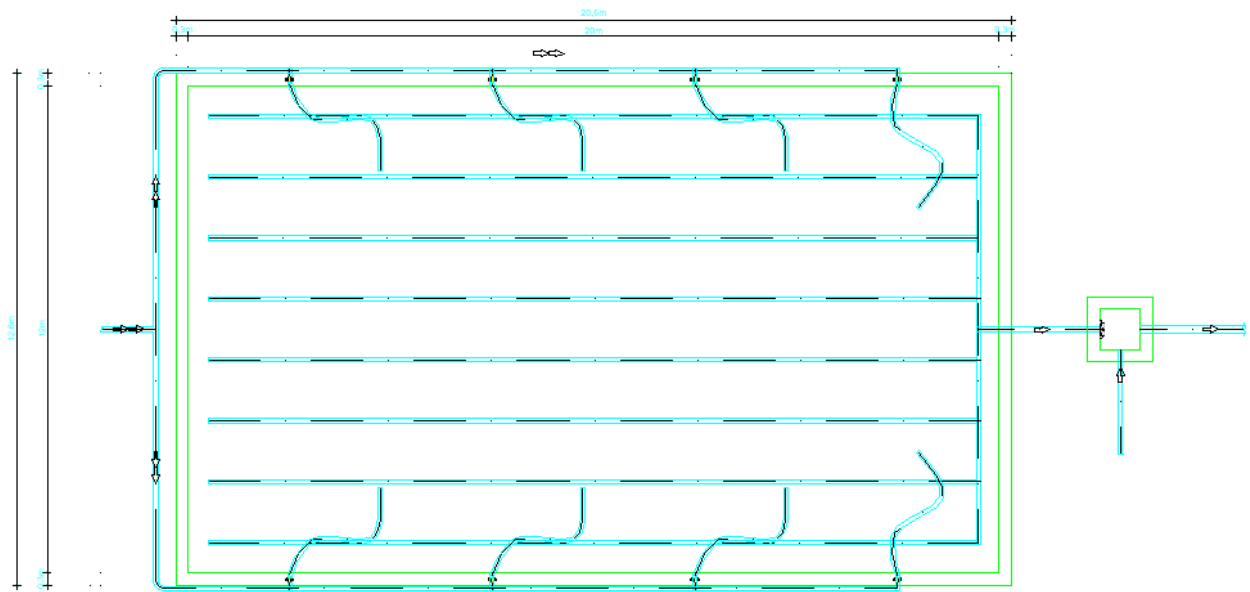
Floor plan of RB in Kastelir (Detailed design, 2016)²⁶
